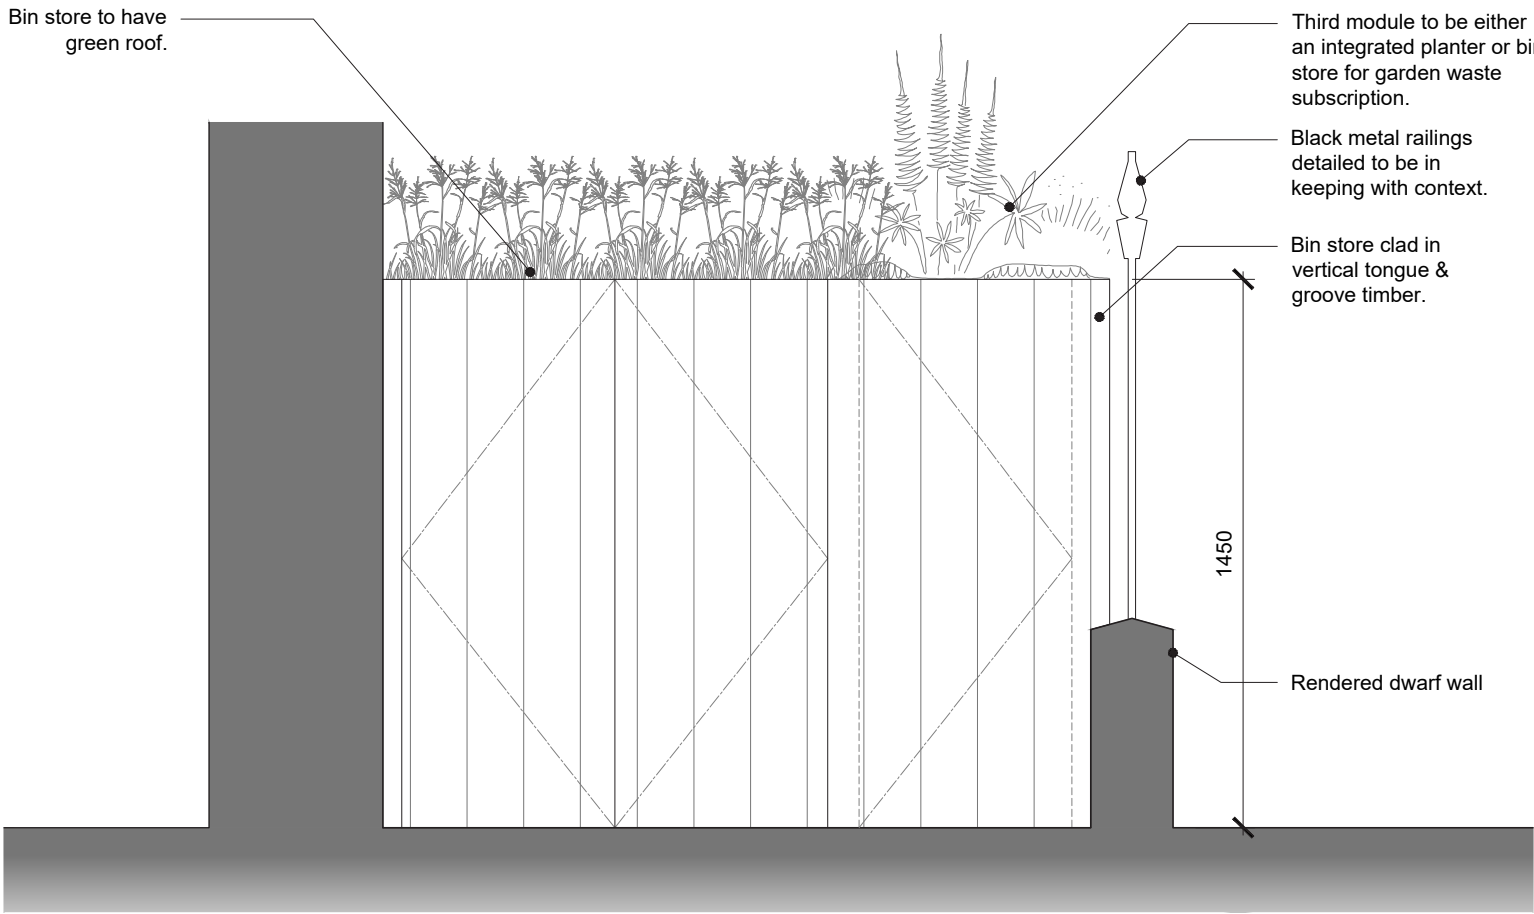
Typical Bin Store Detail - Extract from 1094(51)002
